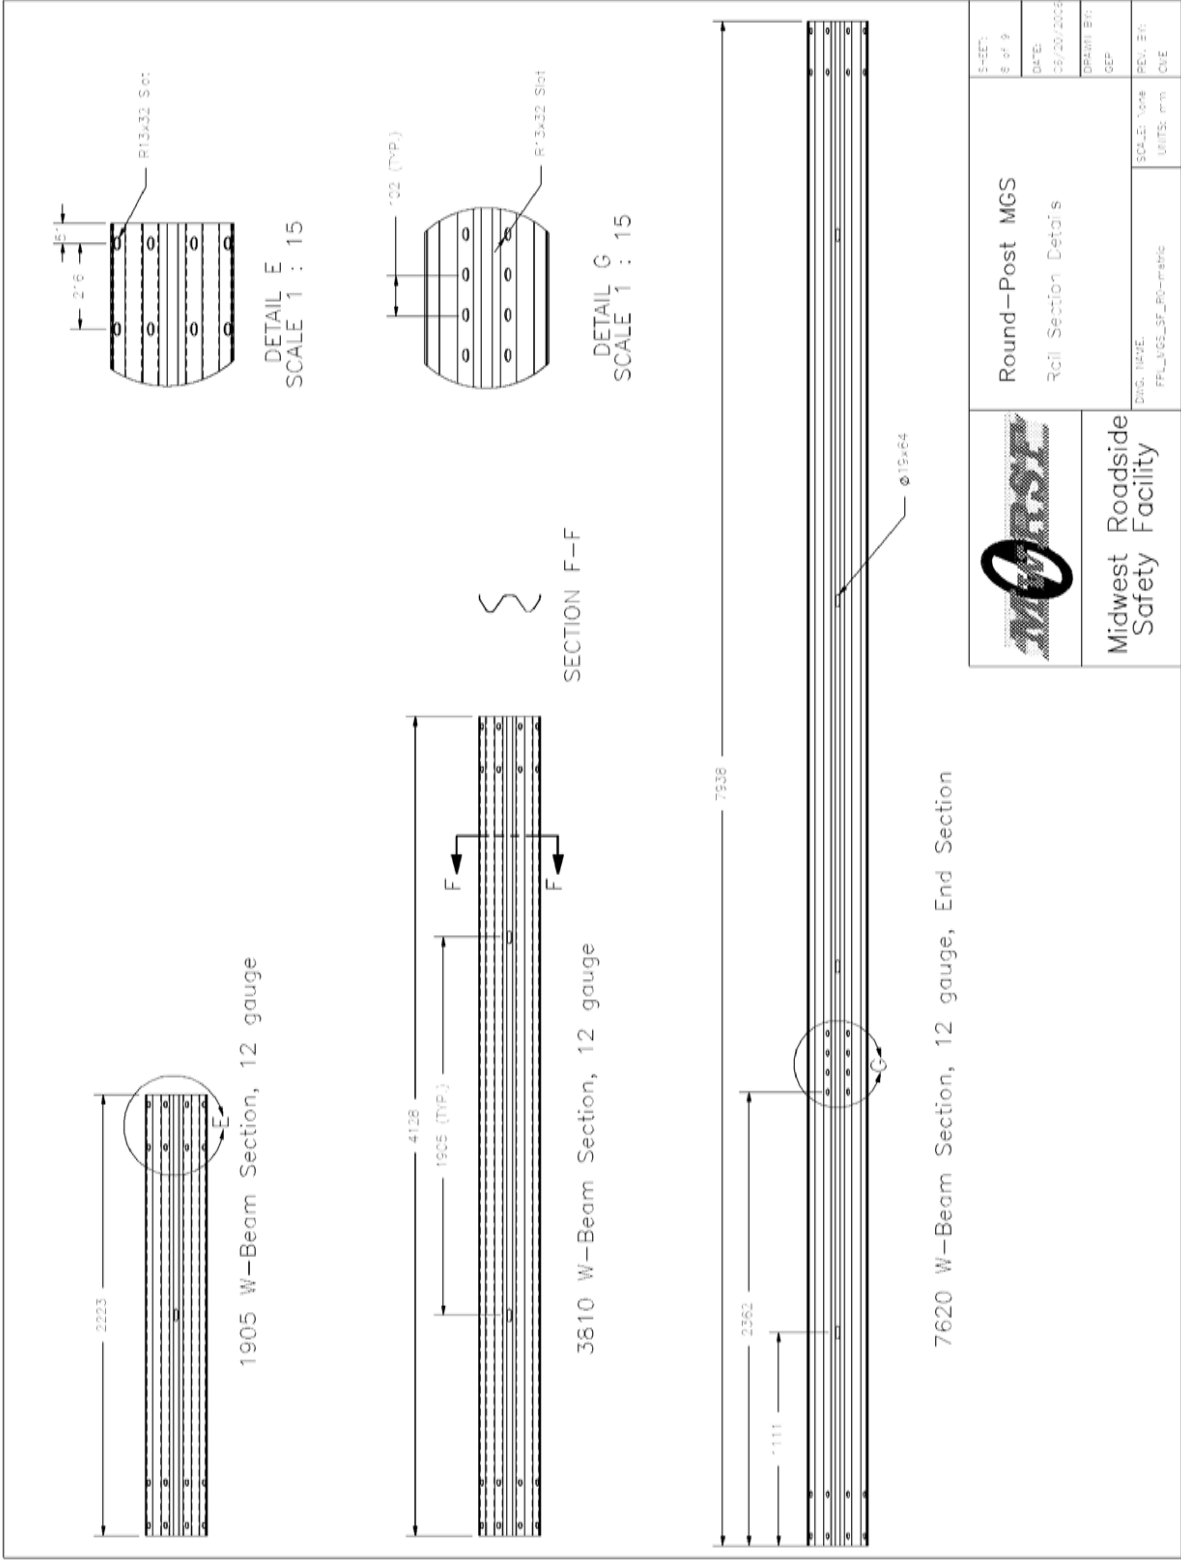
MGS Round Post Southern Yellow Pine Details – Rail Section Detail
